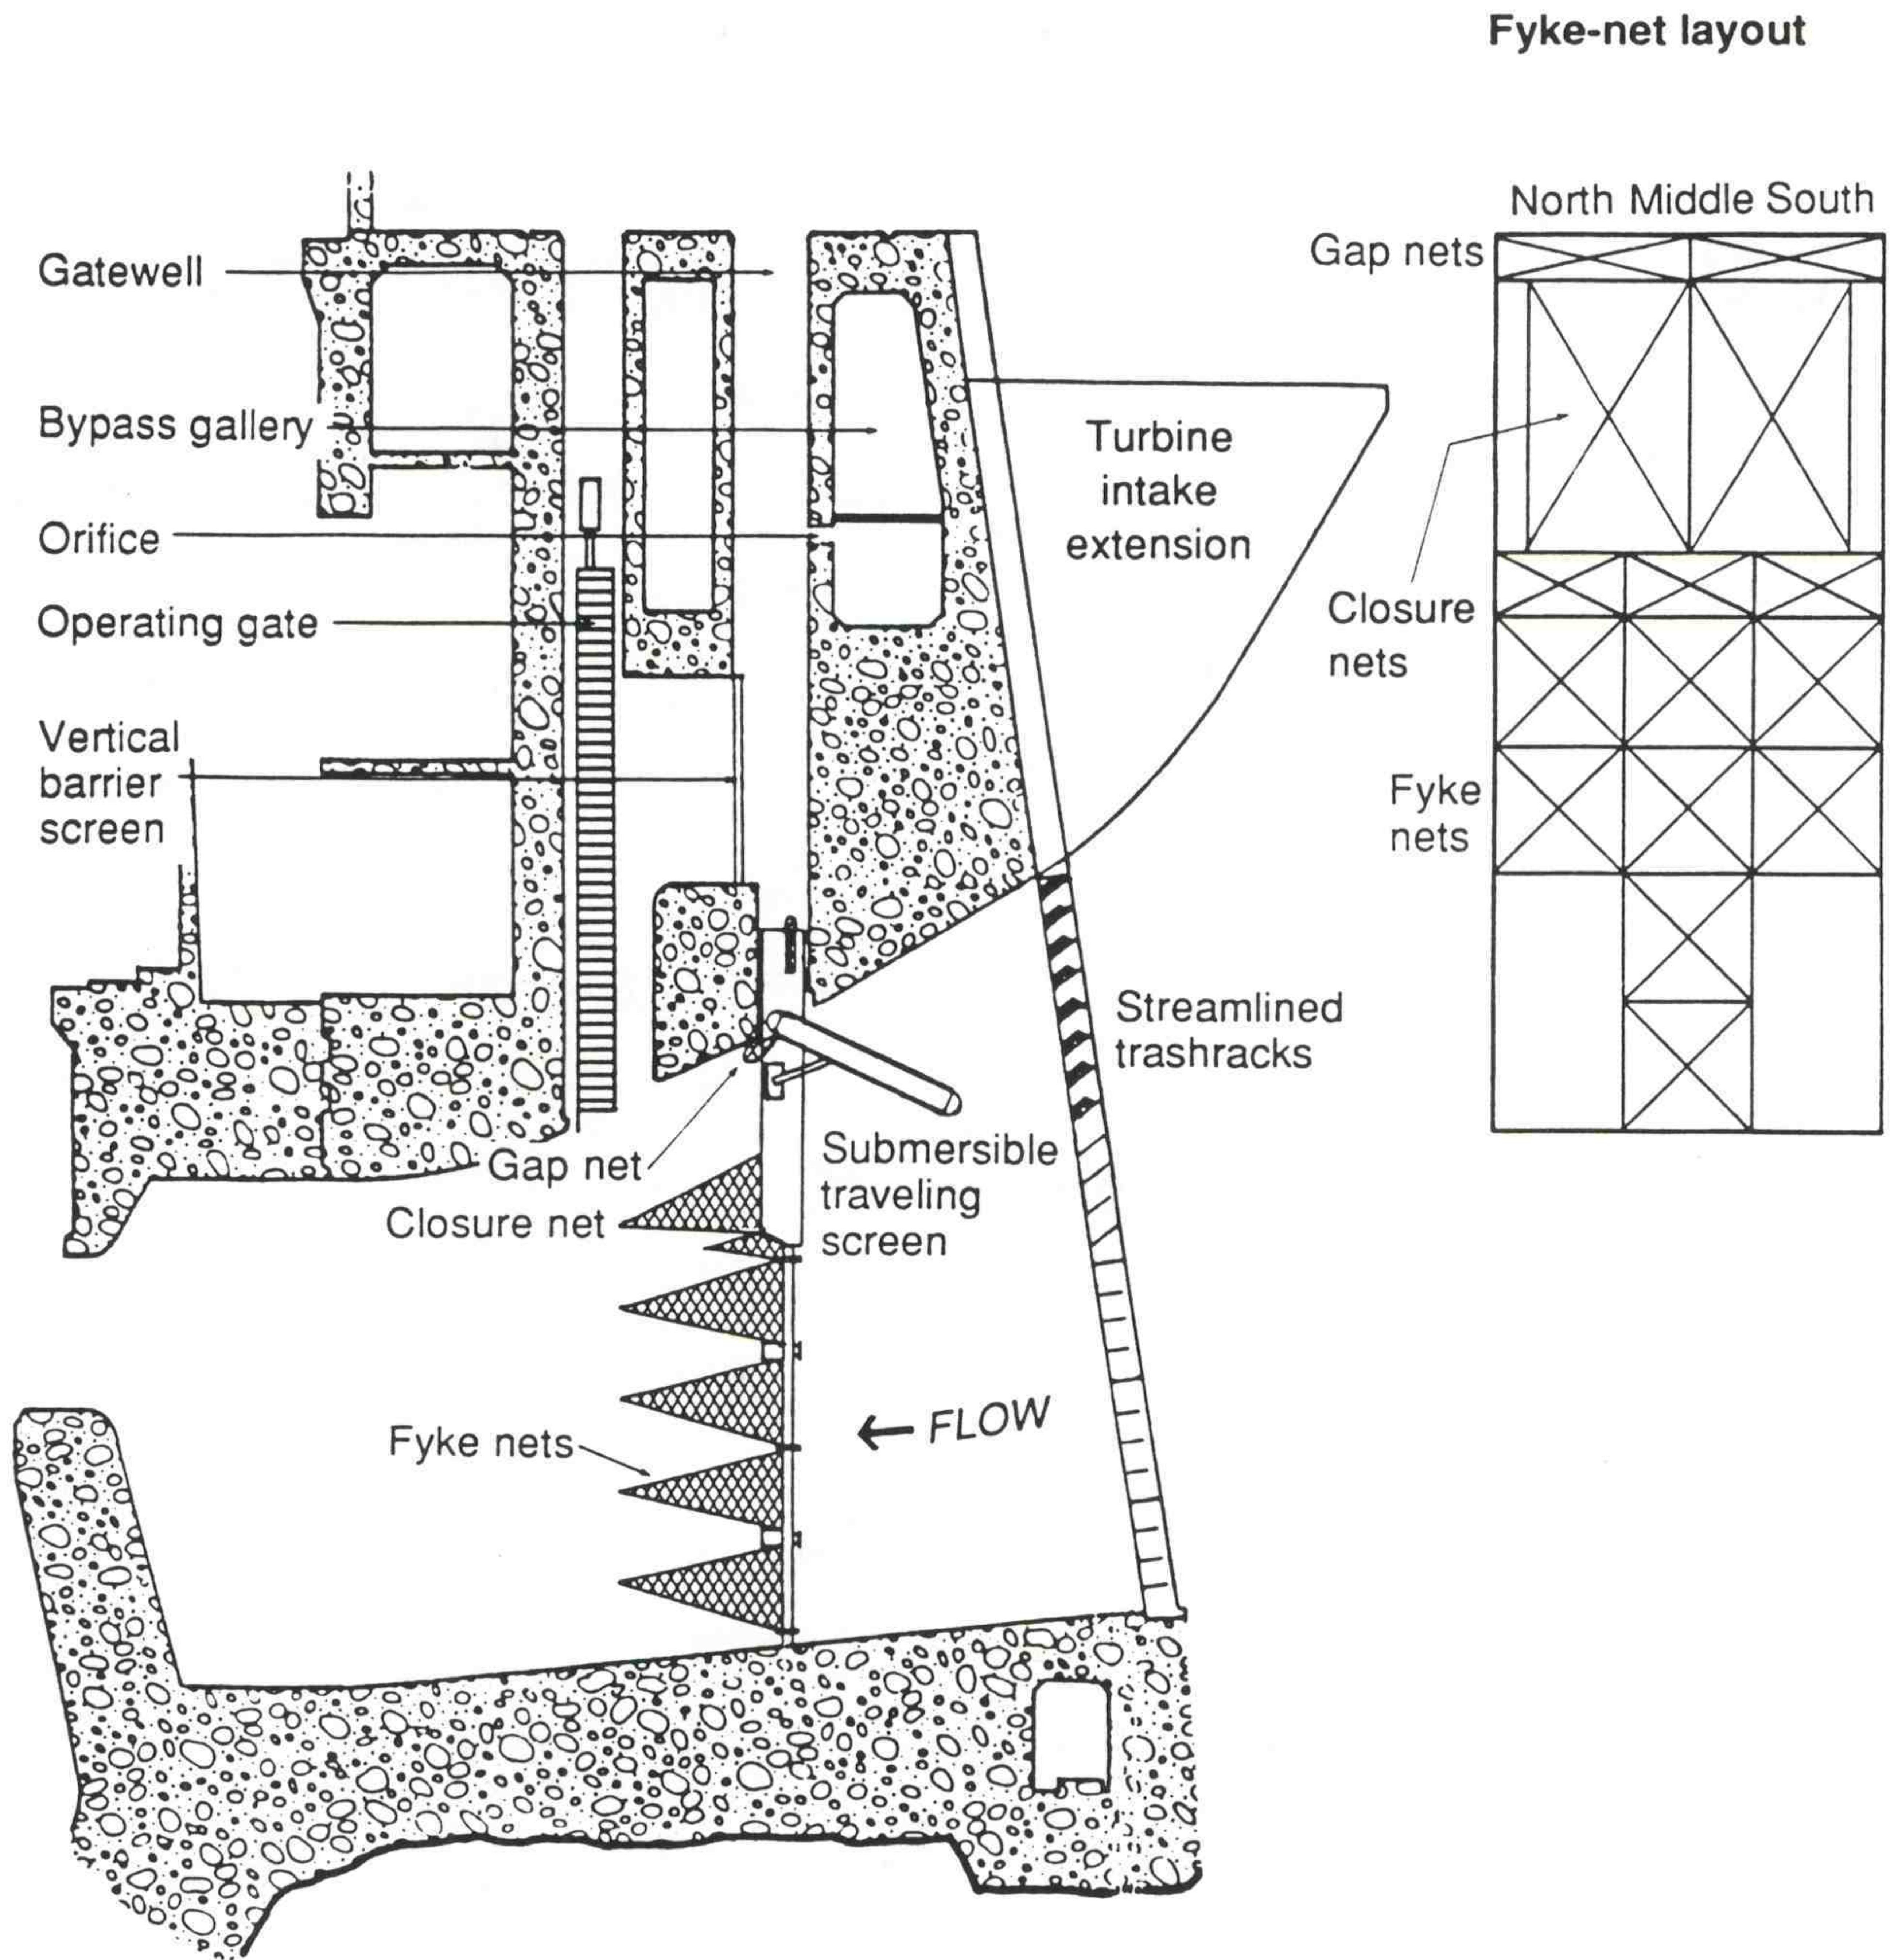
Cross section of turbine intake at Bonneville Dam Second Powerhouse, showing submersible traveling screen, fyke nets, fish bypass system, stored operating gate, and associated structures.
